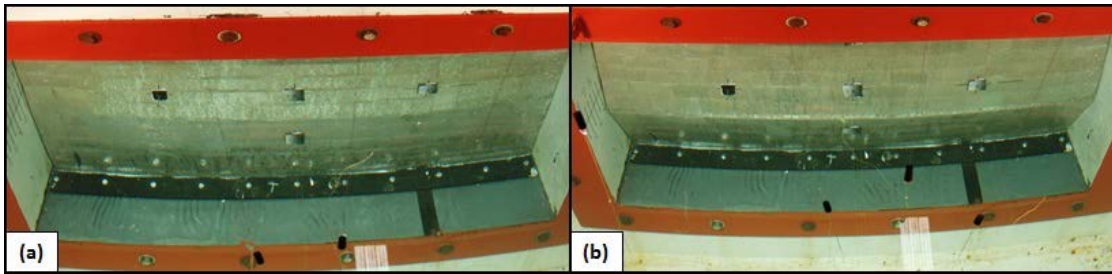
SW21. (a) Wall cracks. (b) Crack continues to deform at mid-span. (Johnson, Davis, Coltharp, Durst, and Smith 2010)
